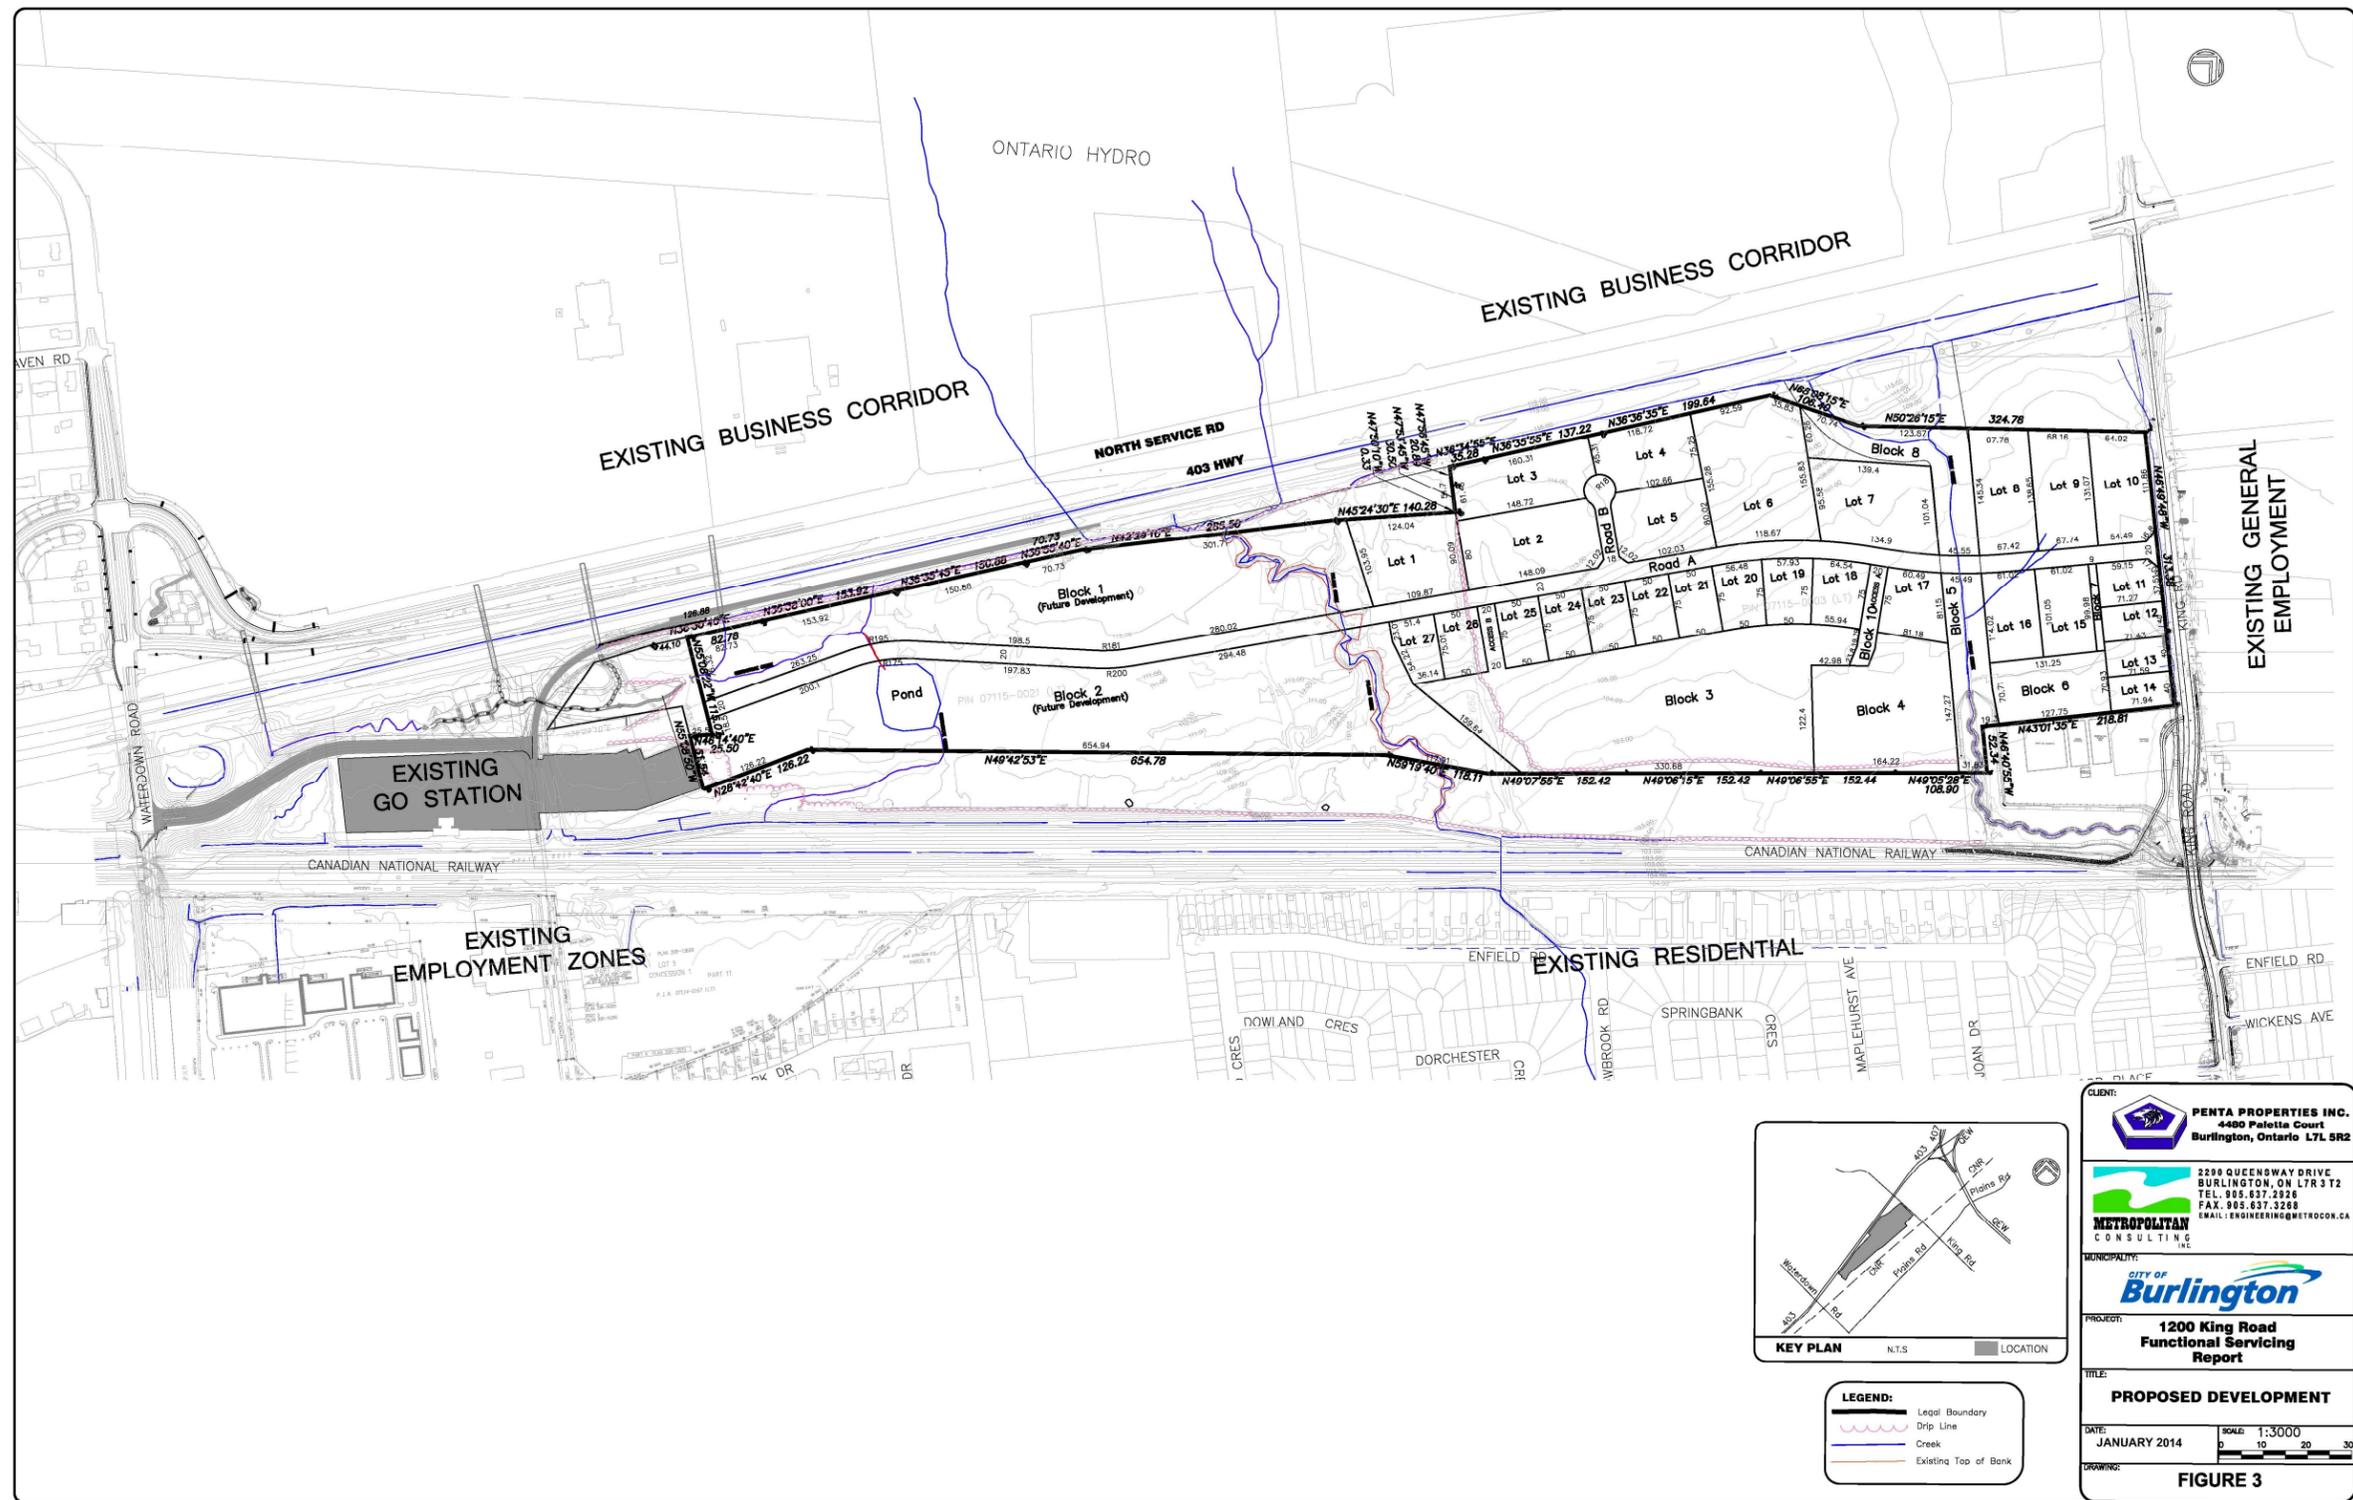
1200 King Road proposed development plan (provided by Metropolitan Consulting)
